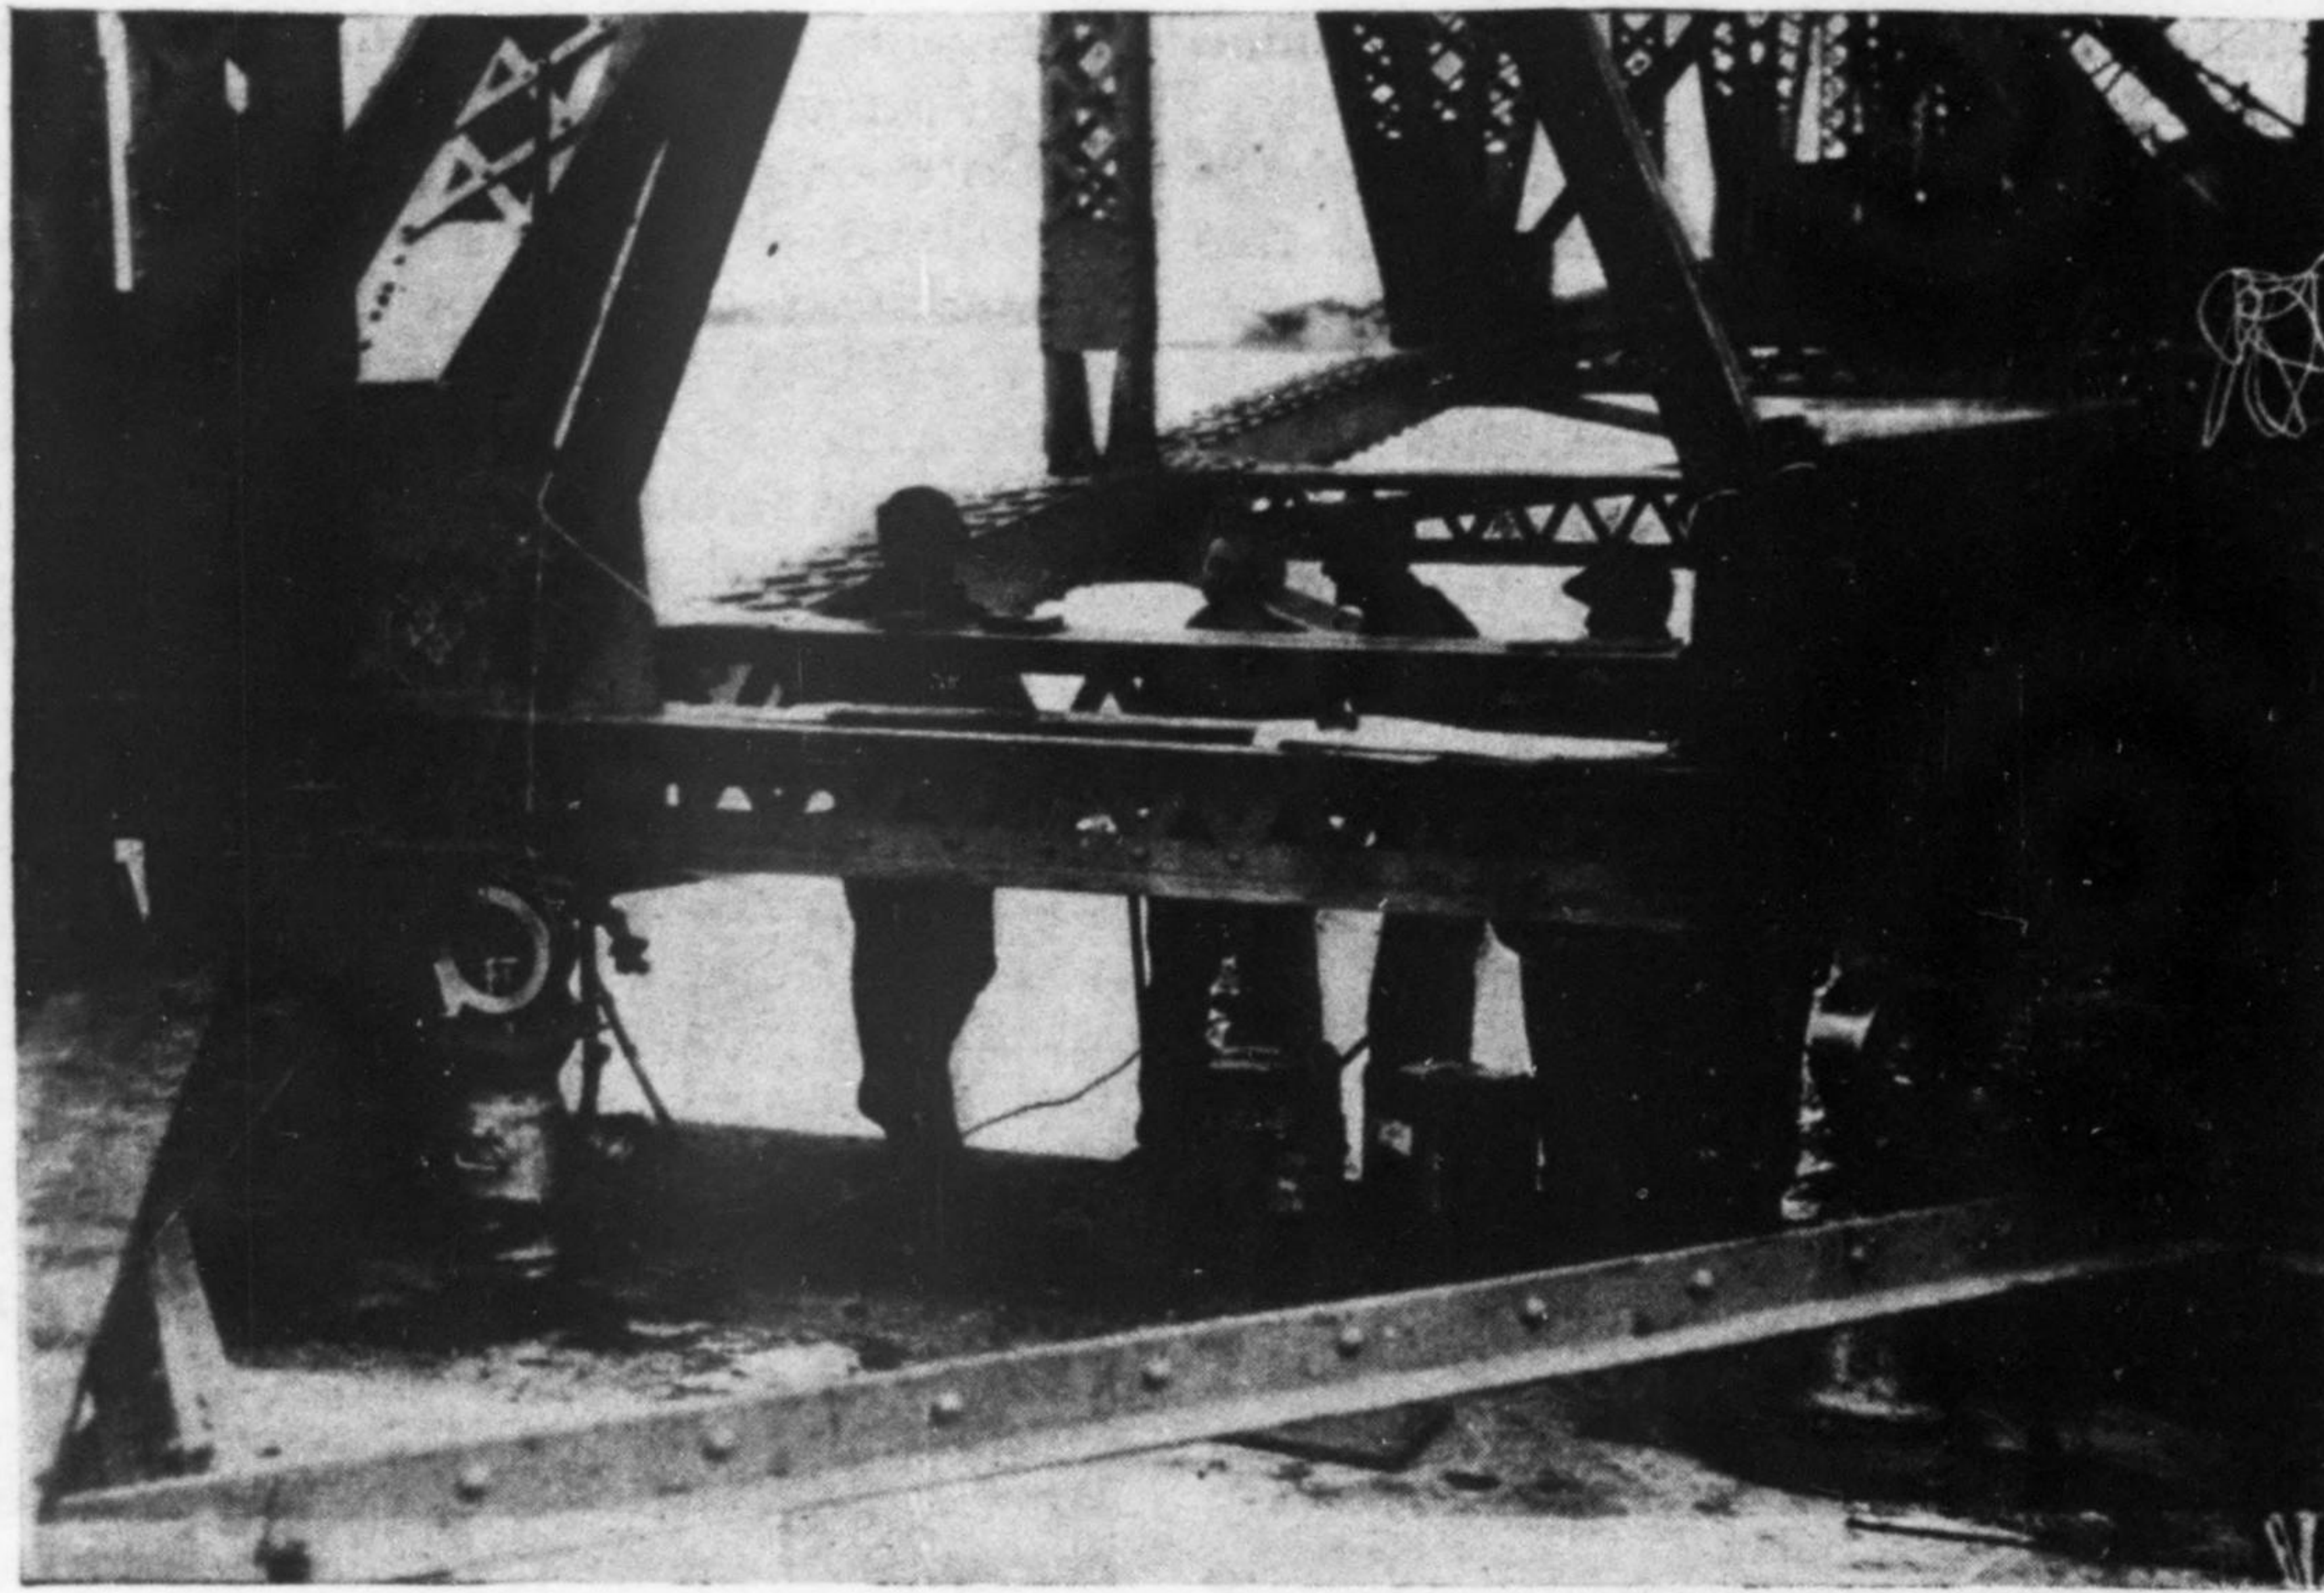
WEIGHING THE REACTION at one end of a two-span continuous truss on the Little Bay Bridge in New Hampshire. Note that proving rings are set on jacks.
